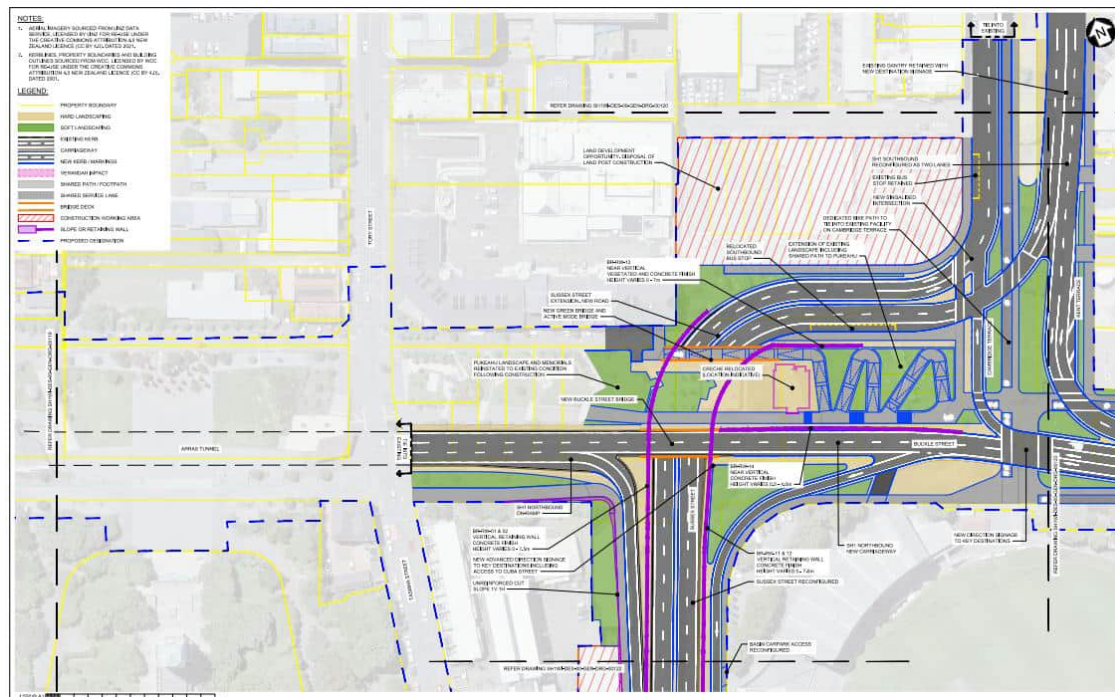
Plan view of SH 1 Wellington Improvements in relation to Gazley Mitsubishi (from General Arrangement Sheet 11 SH1WI-DES-00-GEN-DGR 5-C44340.01)
